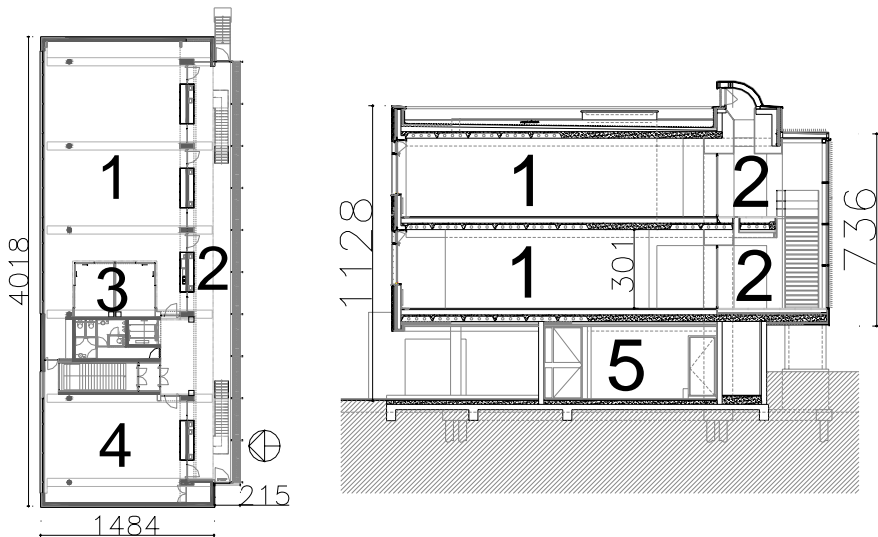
Plan (left) and cross section (right) of the first floor of SD Worx (Kortrijk, Belgium) with open plan office (n°1), circulation zone on the first and the second floor (n°2), conference rooms (n°3), auditorium (n°4) and building services on the ground floor (n°5)
